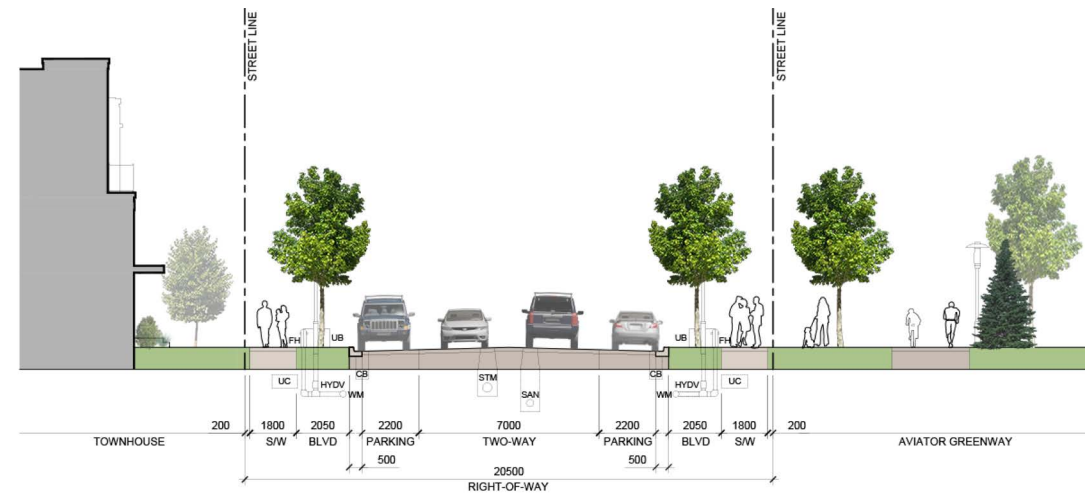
New Aviator Avenue 20.5m R.O.W.
